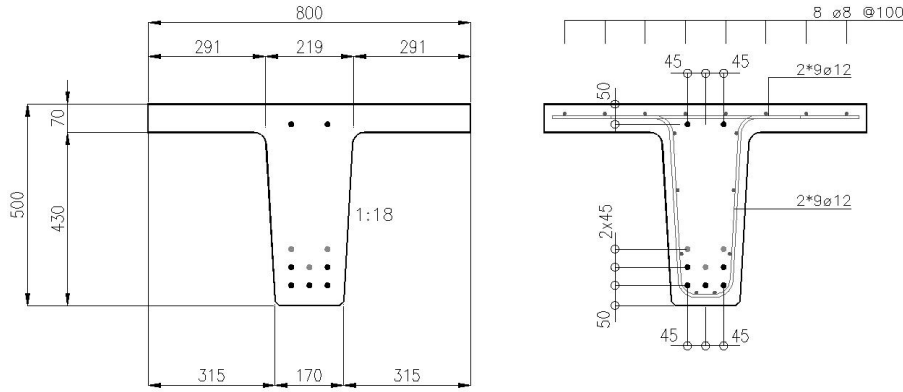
Cross section and reinforcement arrangement at the end of T-beams PV and PF
